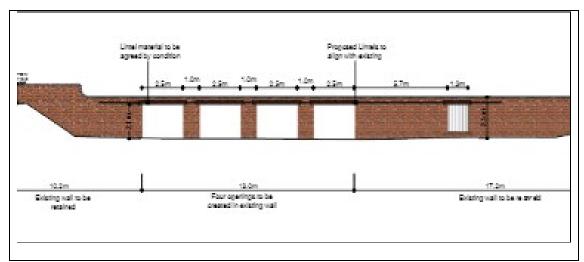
Main connection between canal towpath and application site (Source: Proposed Elevation Canal Wall, Dwg PL114 Rev J)
